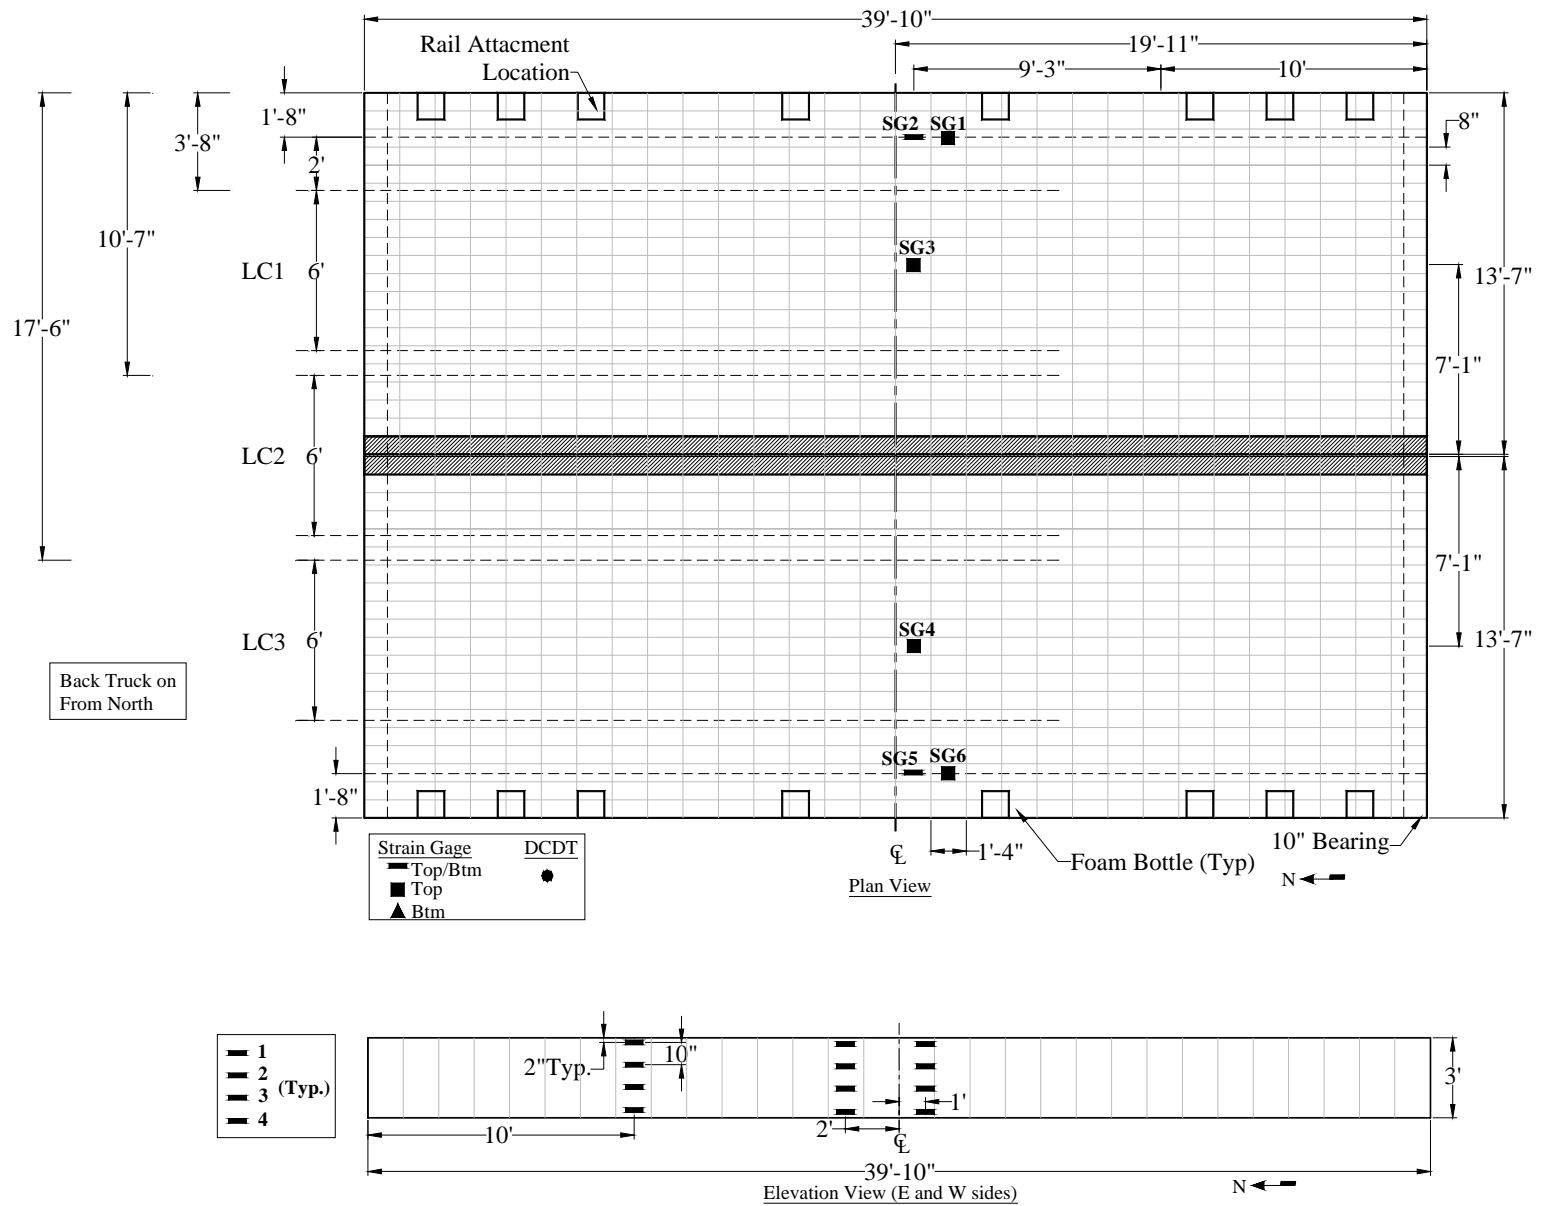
Instrumentation layout, Test 2, FRP Deck Bridge (vehicle facing north).
